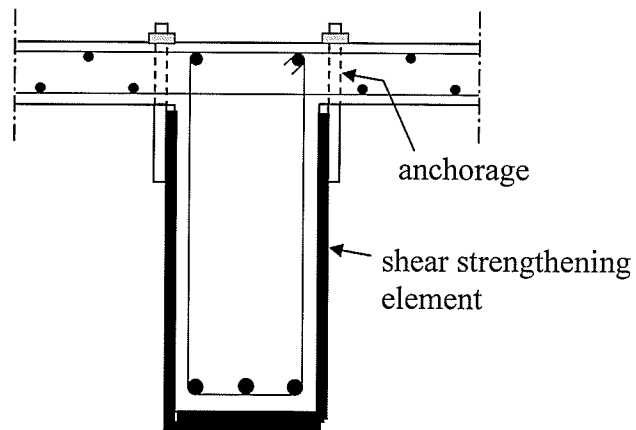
Cross-section of a beam with shear strengthening arrangement [Meier et al., 1995]
